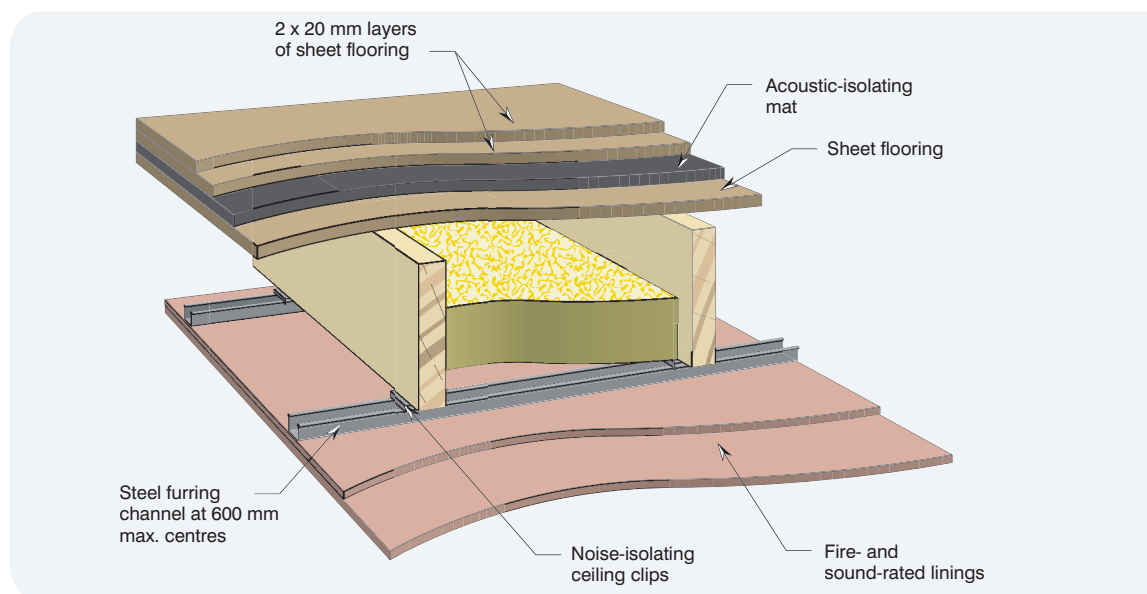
Adding mass to floor system through the use of additional floor sheets.
